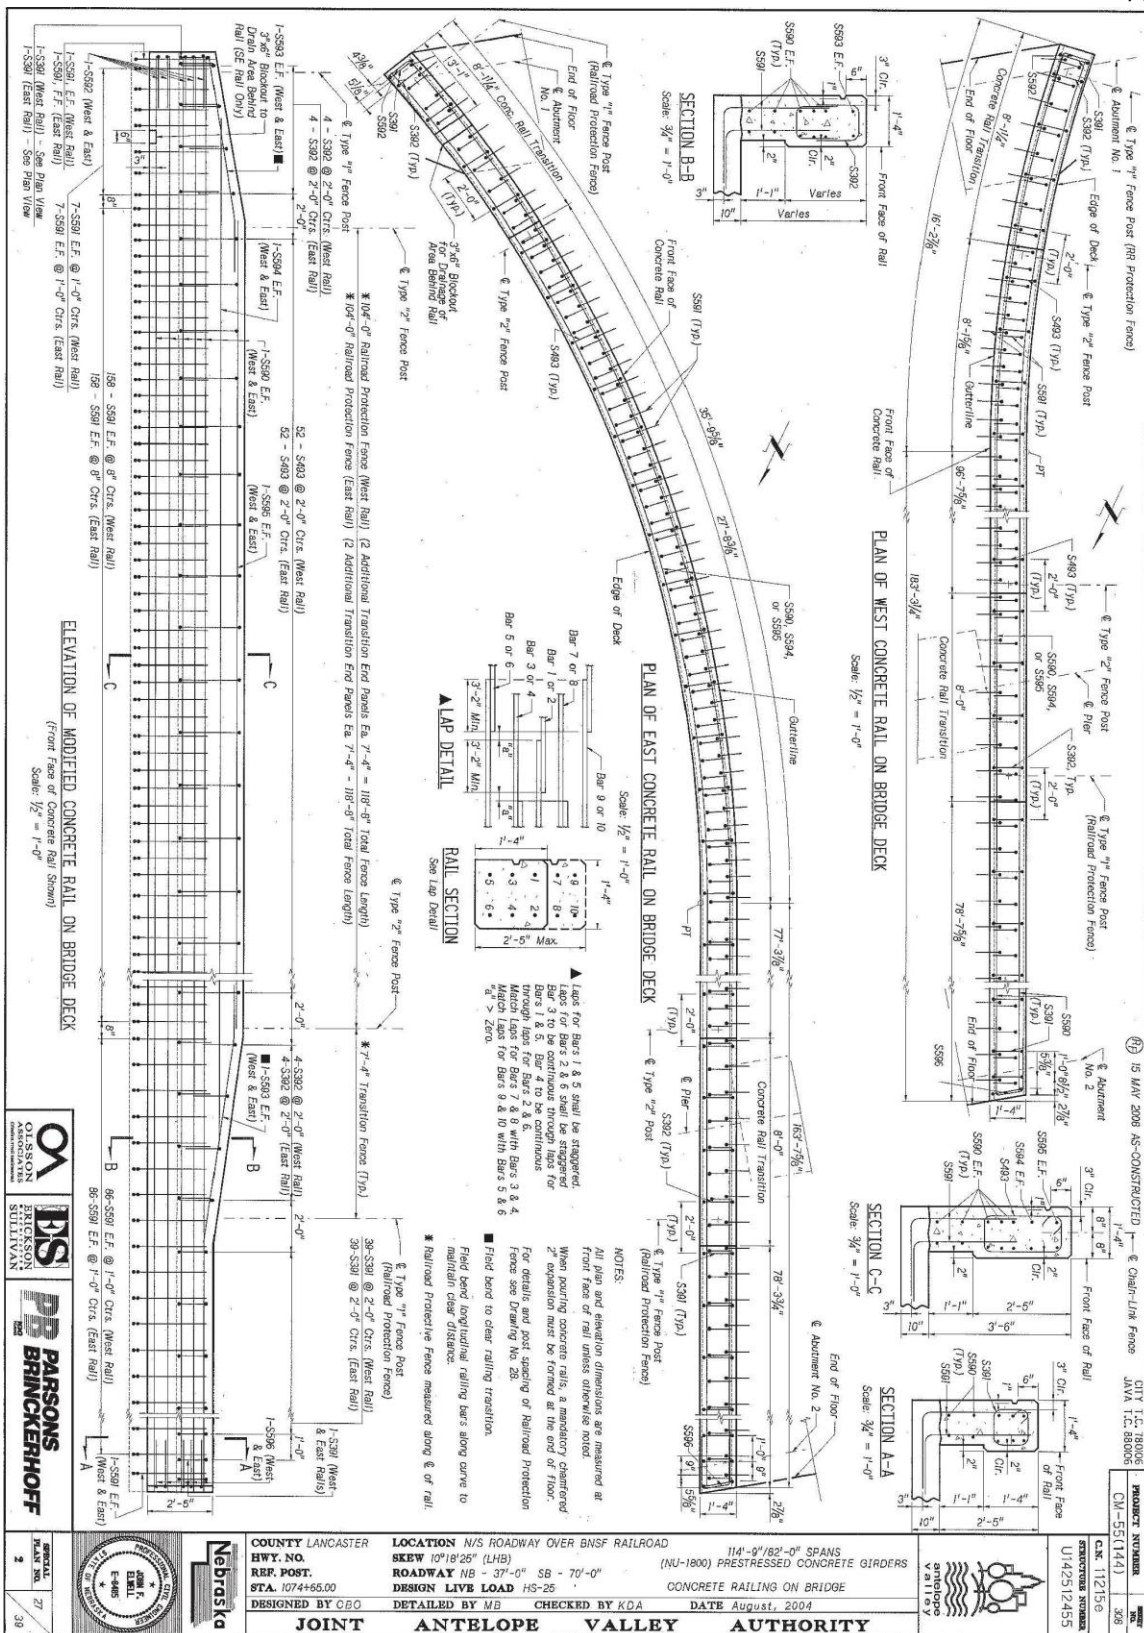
Aesthetic Debris Fence Bridge Parapet and Placement Details
